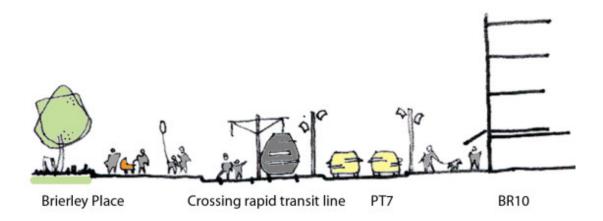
Cross Section Brierley Place (PT7 - BR10)
